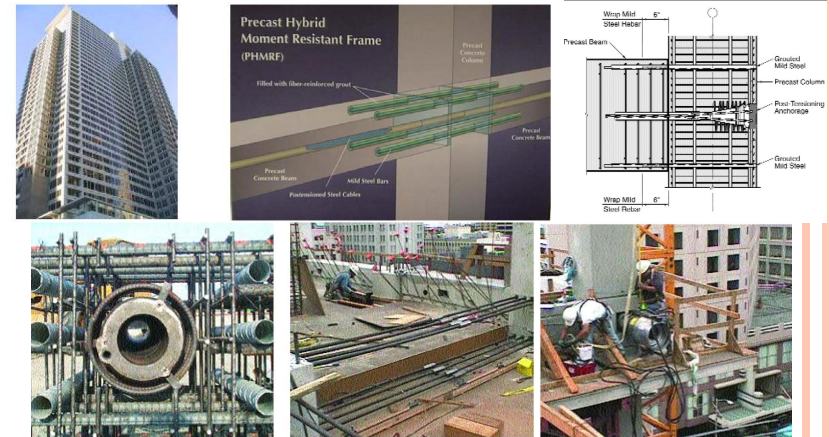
Paramount Building, 39-storey building, San Francisco [3,13]
